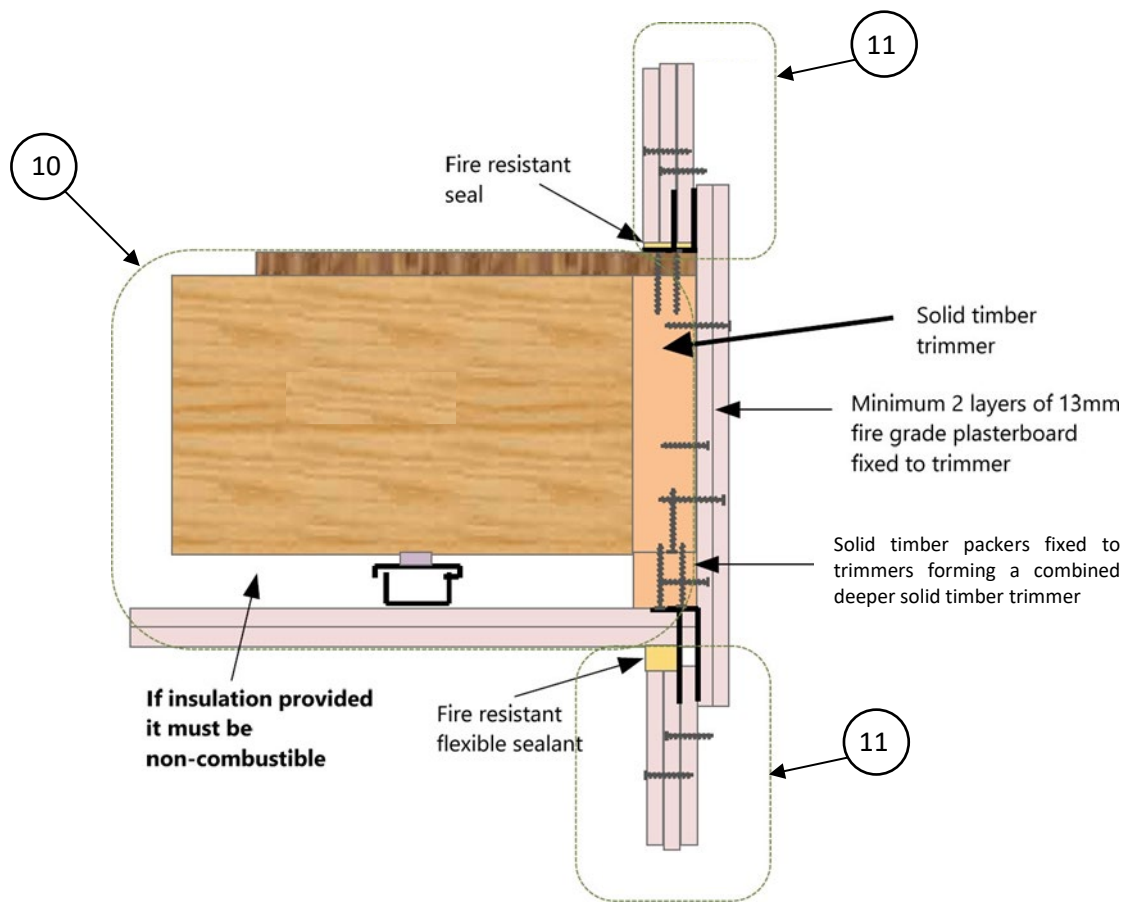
Solid laminated shaft wall interface with timber floors maintaining shaft continuity – Section view
